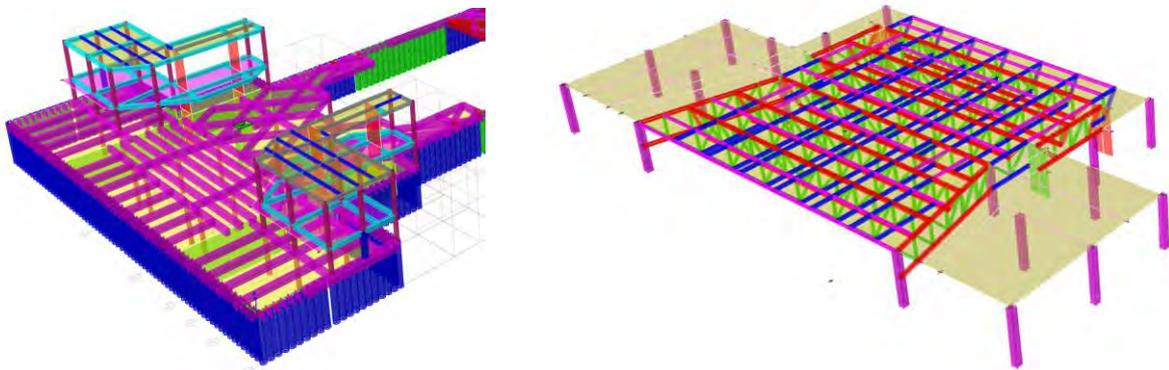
Numerical structural model of reinforced concrete structure (left) and steel roof structure (right)
